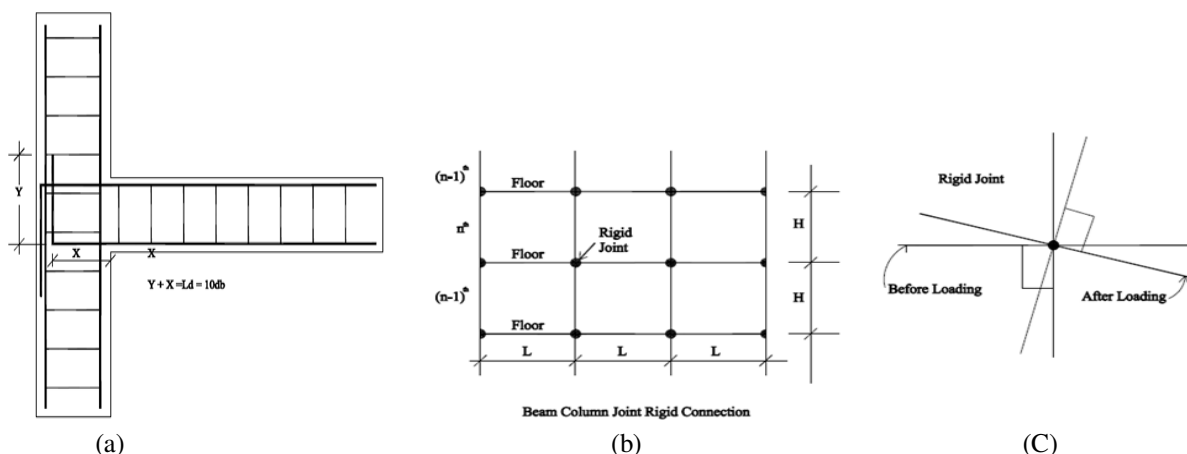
Beam Column Joint Connection (a). (b) & (c)
